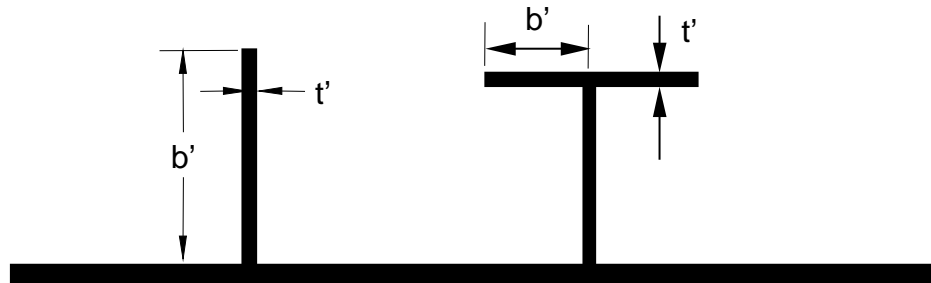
Compression Flange Showing Rectangular and T-section Stiffeners
